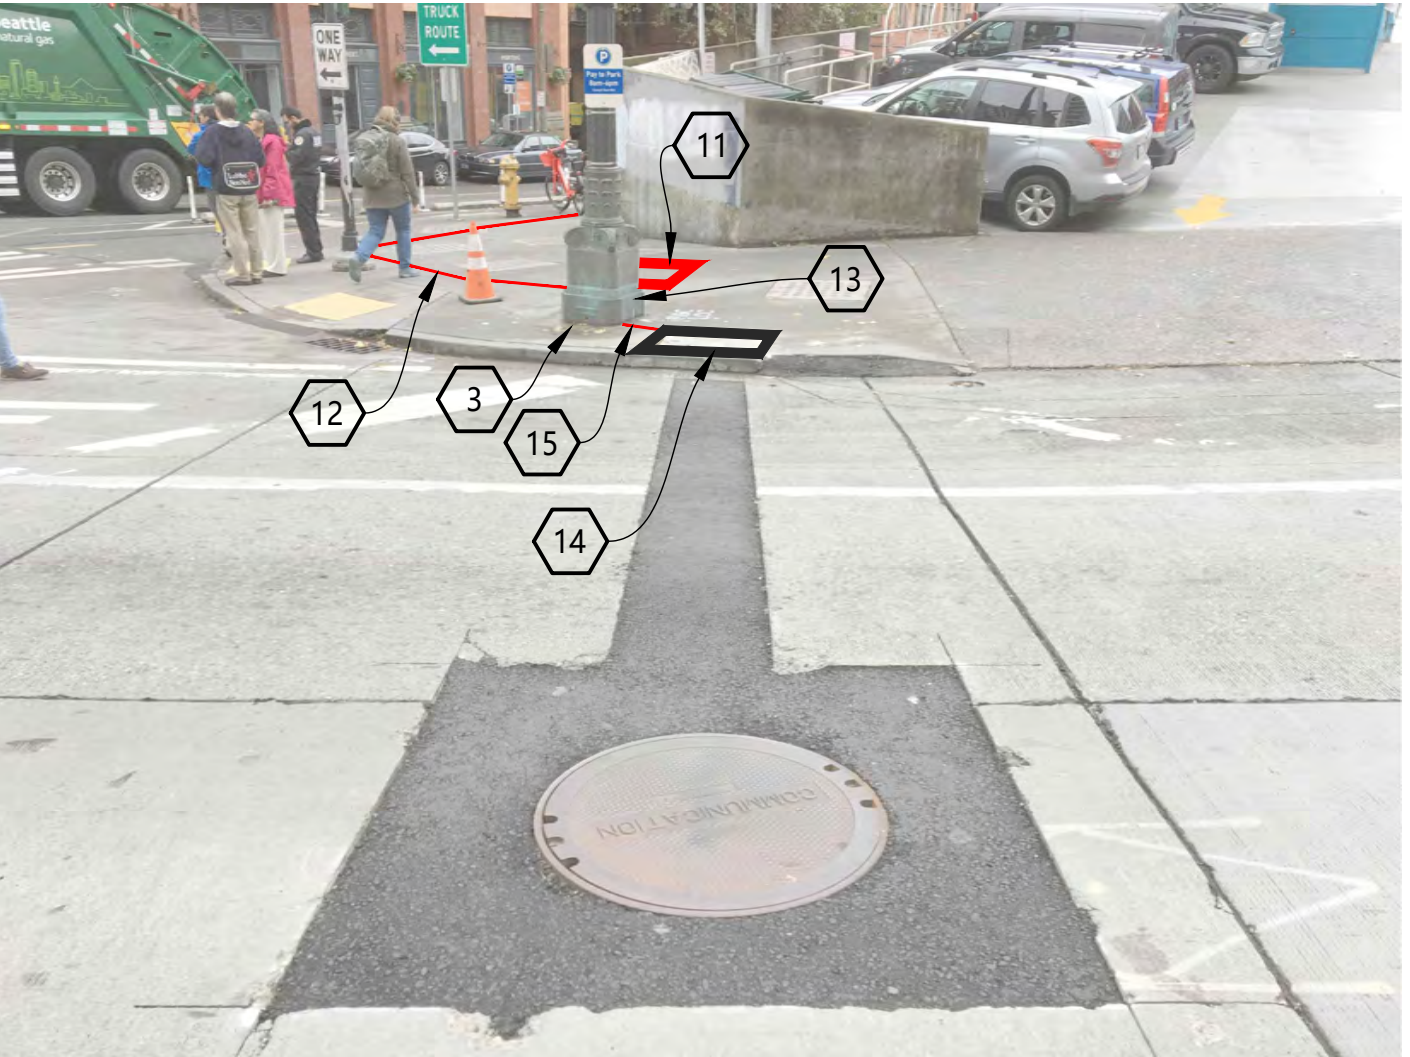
FACING WEST ON EAST SIDE OF 2ND AVE
